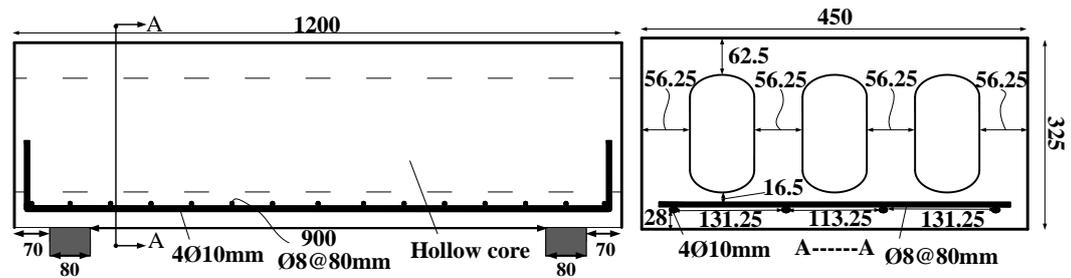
The Details of Section and Side View of HCS Specimen (HCS-200-A) (all dimensions in mm)
